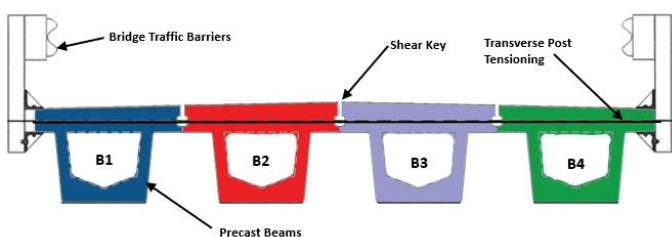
Transversely Post Tensioned Precast Concrete Beam Units
